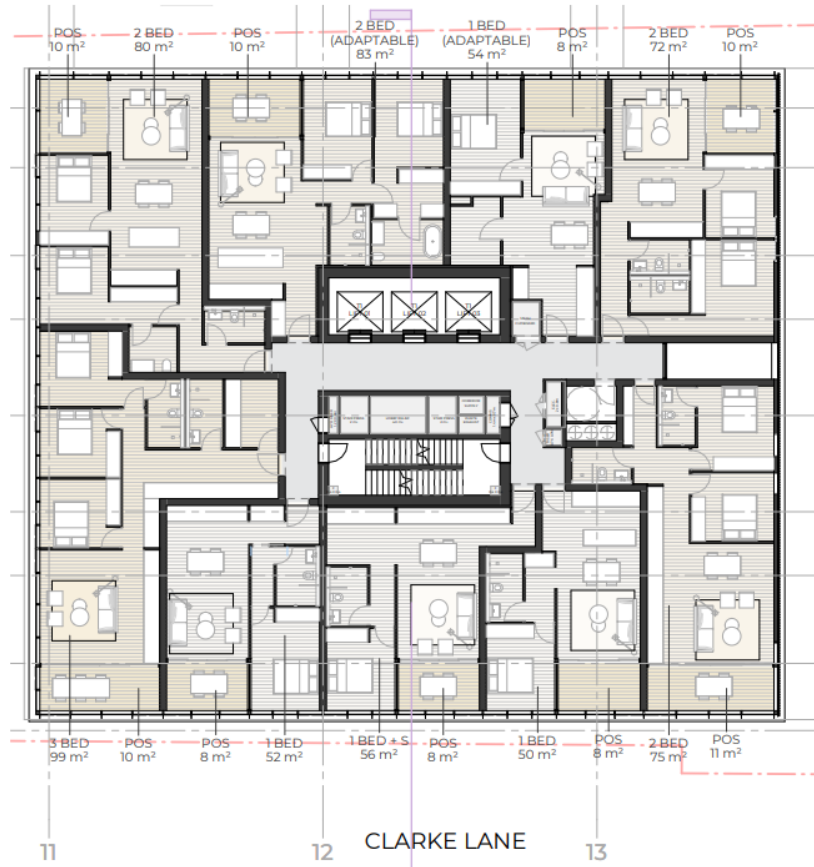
Indicative Floor Plate (Source: Woods Bagot, Major Projects Portal)
